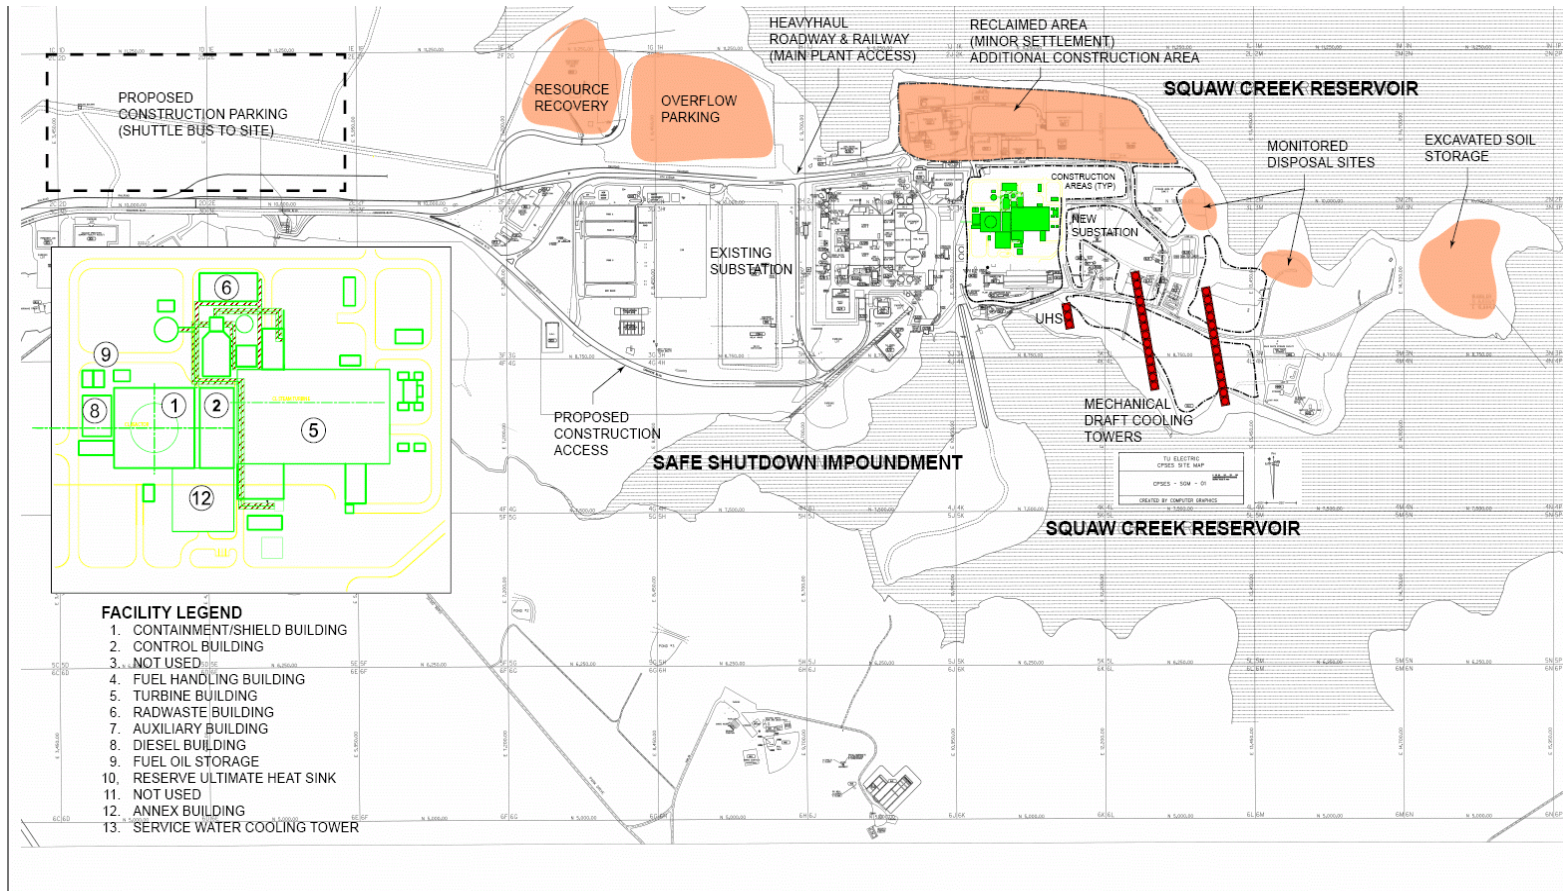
F-1. Conceptual Site Layout of a Single Unit ABWR at Comanche Peak
